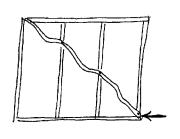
If a boarded frame wall has a strength of 1.0, diagonal bracing would have a value of 3.0, but only 1.5 with door and window openings. Plywood is tops with eight times the strength of a boarded wall.
